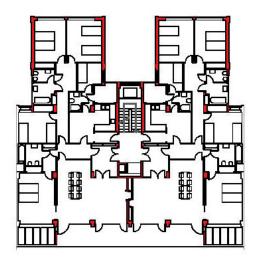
F. Mitjans: Illa Seida Housing building. Plan of a dwelling unit scale 1:500. Redraw M. Lucchini.
